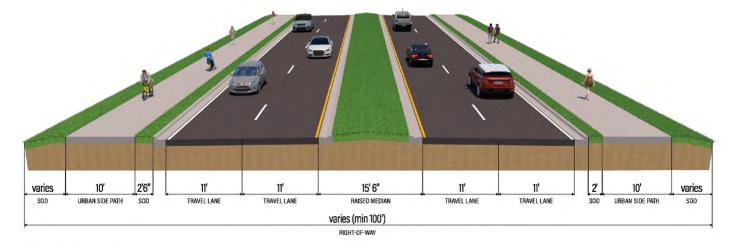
US 17/92 Preferred Typical Section (Segment 3)
